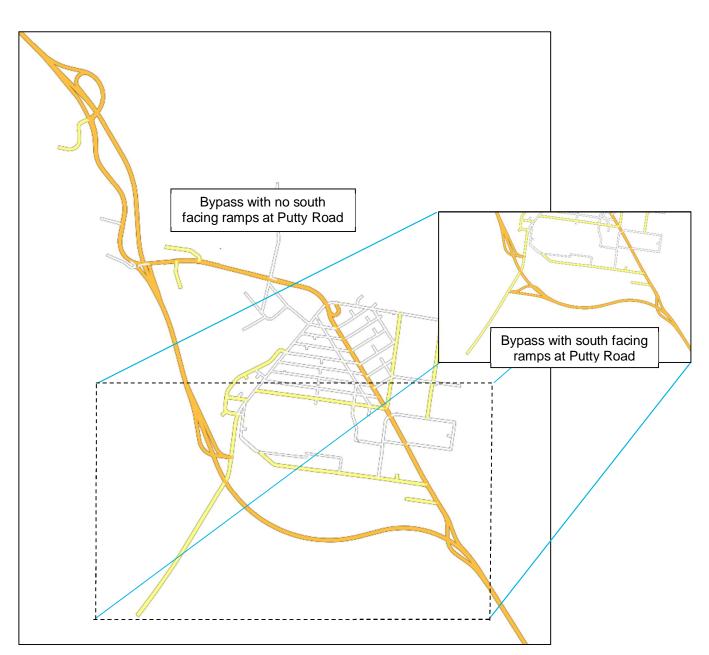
Singleton Bypass Alignment 'with' and 'without' south facing ramps at Putty Road
